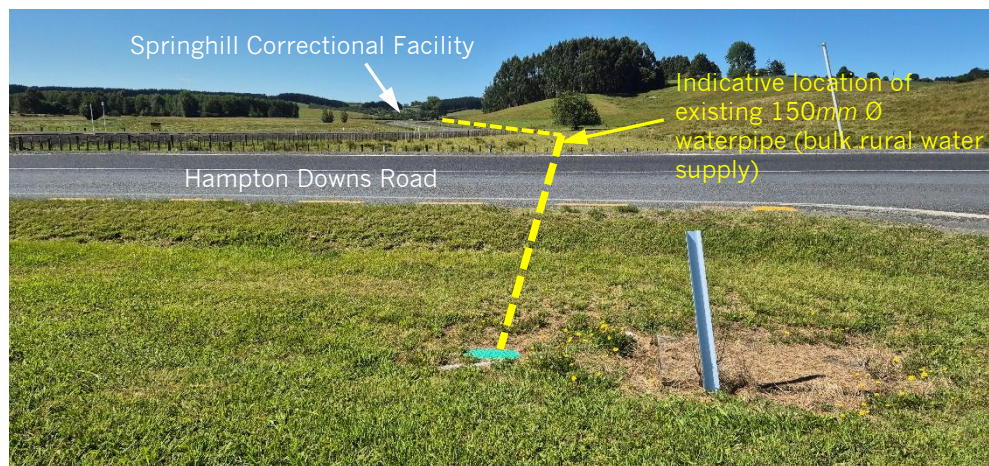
Figure C: Existing TKWA pipeline network showing a 150mmØ pipeline located along the western side of the service road (often referred to as Harness Road) to the Spring Hill Corrections Facility, crossing Hampton Downs Road (in the foreground)
